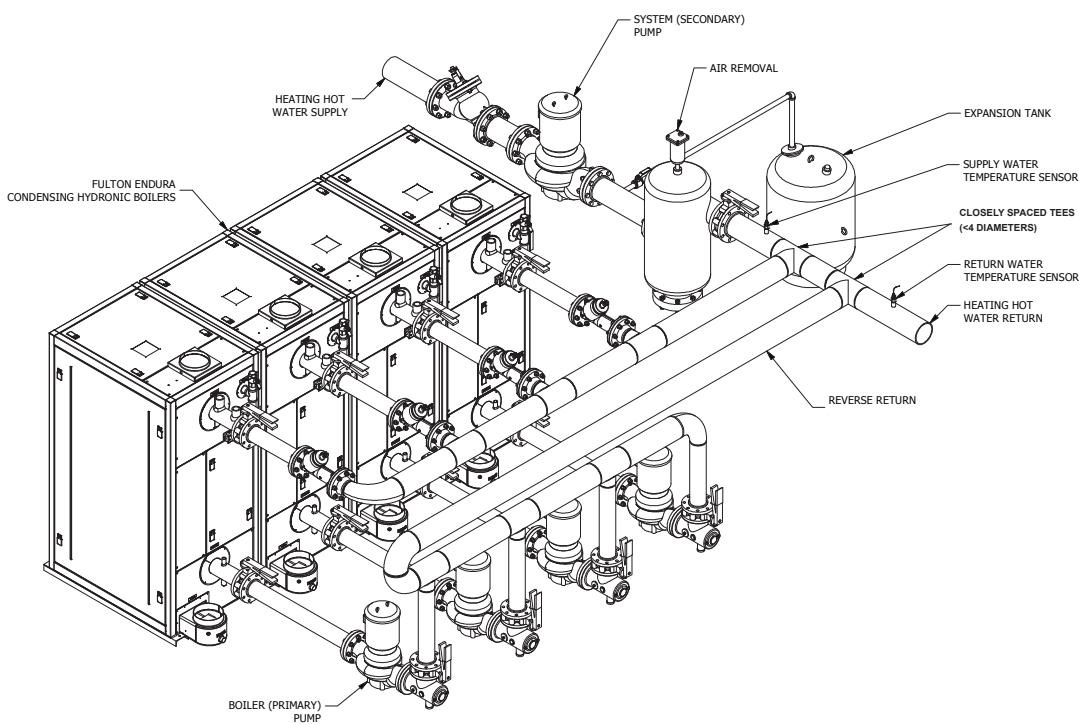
SAMPLE PIPING LAYOUT, PRIMARY - SECONDARY PIPING; MULTIPLE BOILERS
